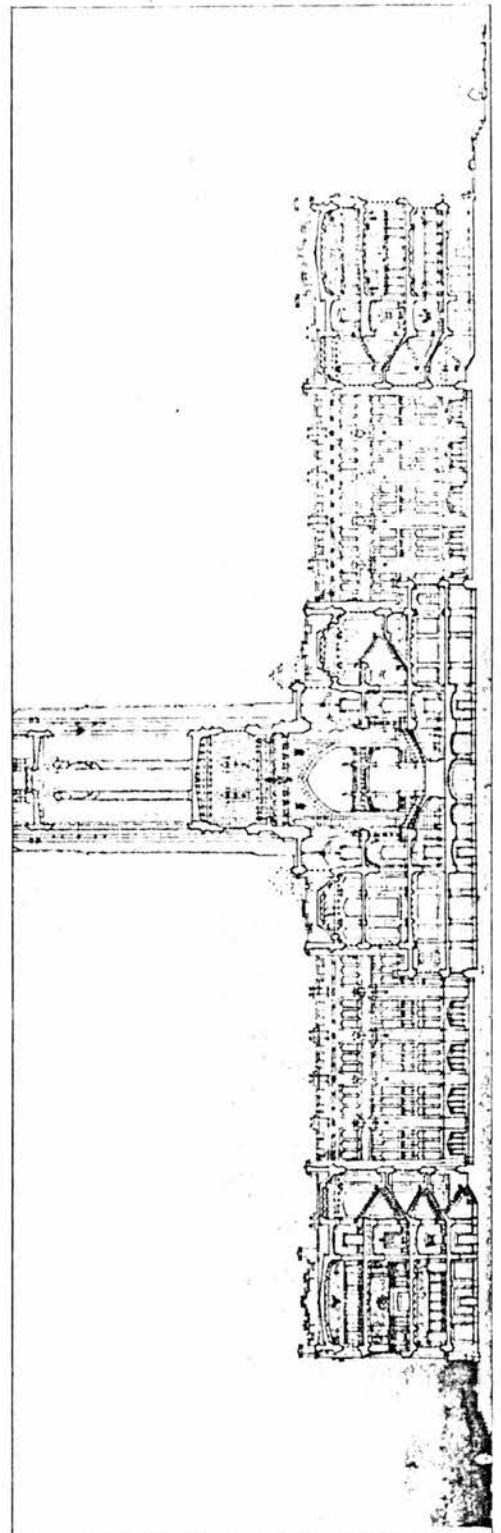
, Design for proposed Parliament Building, Regina, Saskatchewan, side elevation, Frank Rattenbury, architect, (1907).
